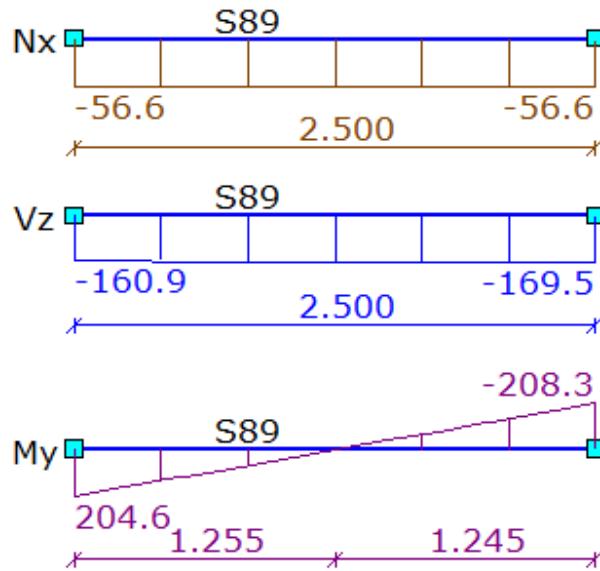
Internal forces of the connecting beam with high stiffness
